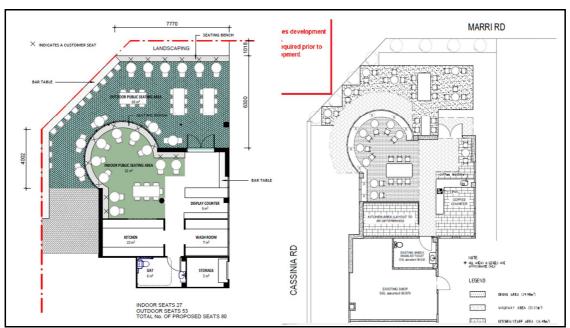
Left floor plan is the layout seeking approval from the City of Joondalup, with the right layout being the current approved layout from 2018.
